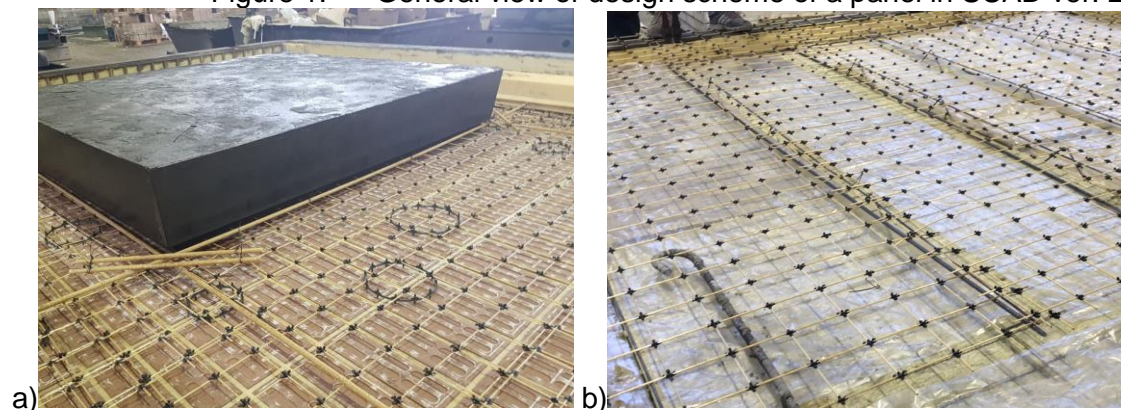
General view of exterior (a) and interior (b) layer's reinforcement layout
